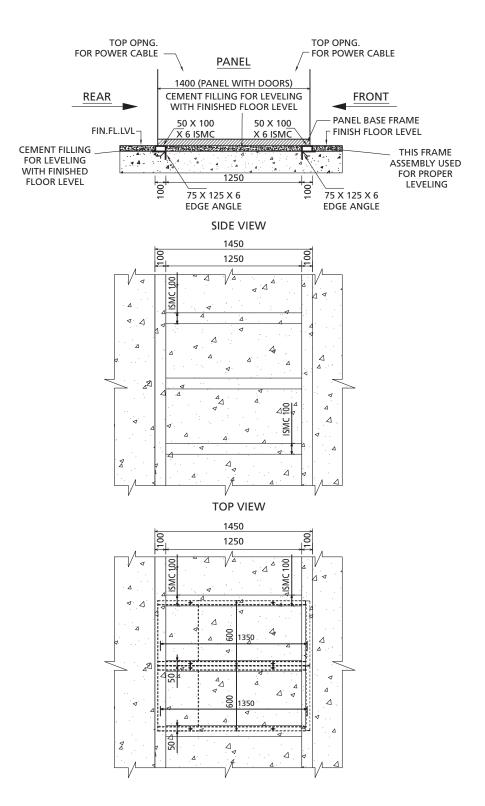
c - Typical Floor Cutout Arrangement for GIS SWBD (Top Cabling)
